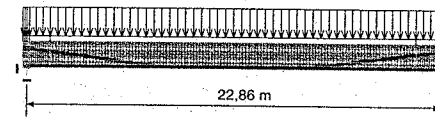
Beam model with longitudinal reinforcement, bearings and distributed load.
